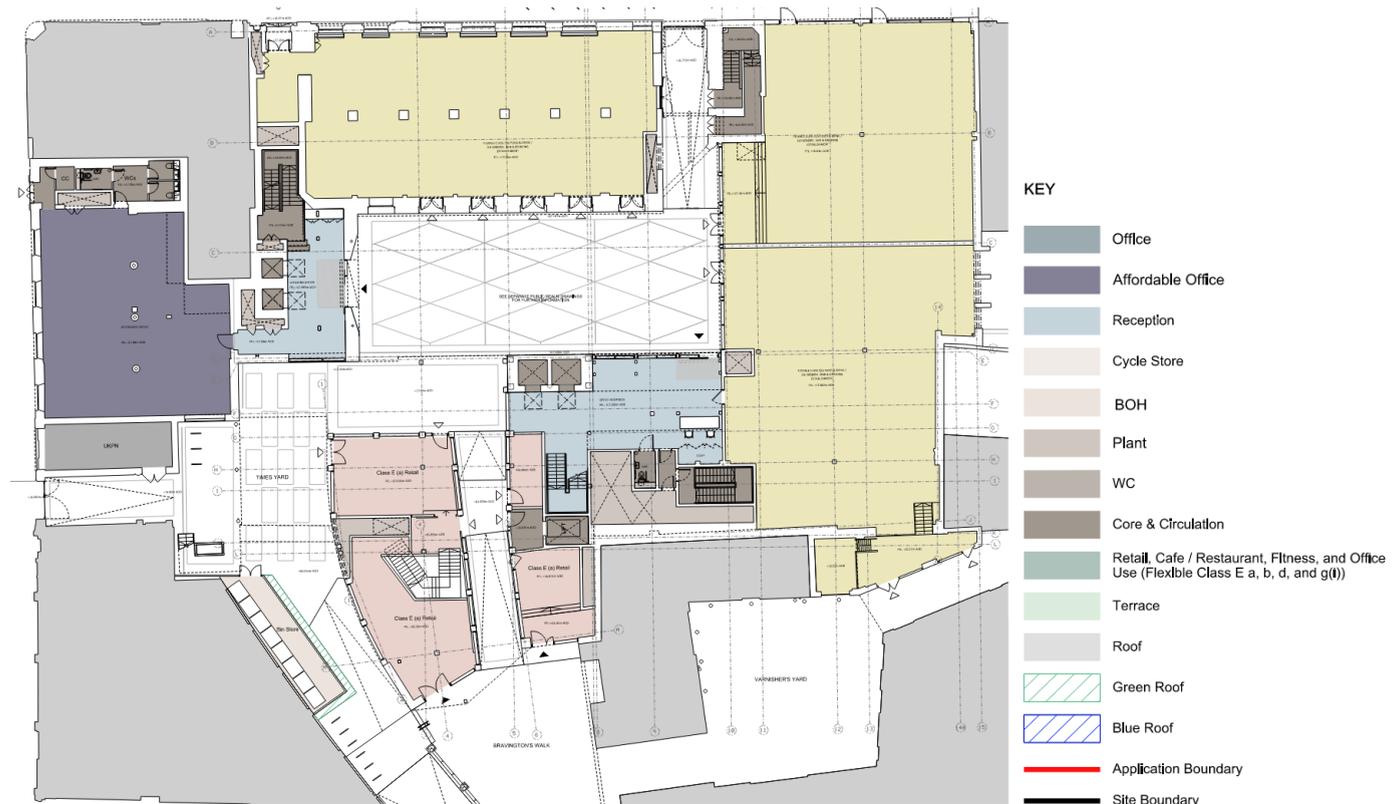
Revised proposed ground floor plan – Provision of Affordable Workspace
